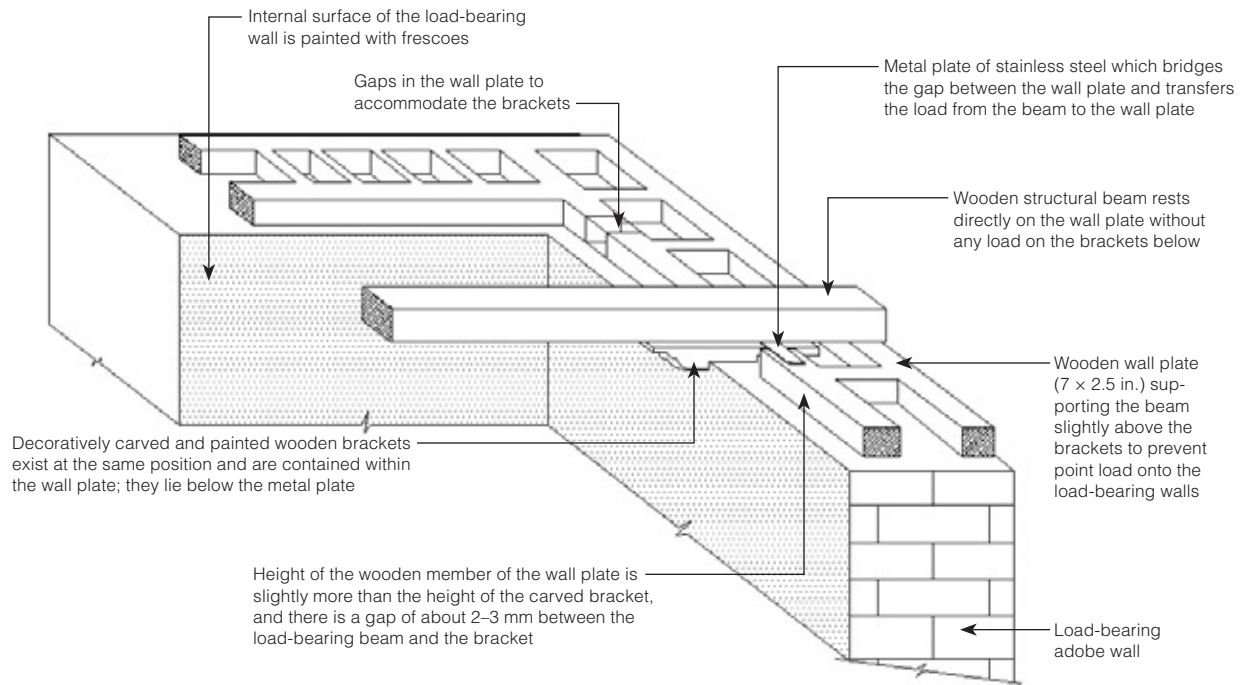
Wall plate detail for the historic earthen structures in the Spiti and Kinnaur Valley of the western Himalayan region, giving detail and sizes of the wooden wall plates running all along the length of the load-bearing adobe walls, to evenly distribute the roof load carried by the rafters and beams. Originally drawn by C. Chaudhry; taken from the phase 3 report of the Nako Preservation Project (Khosla 2004), with some modifications.
